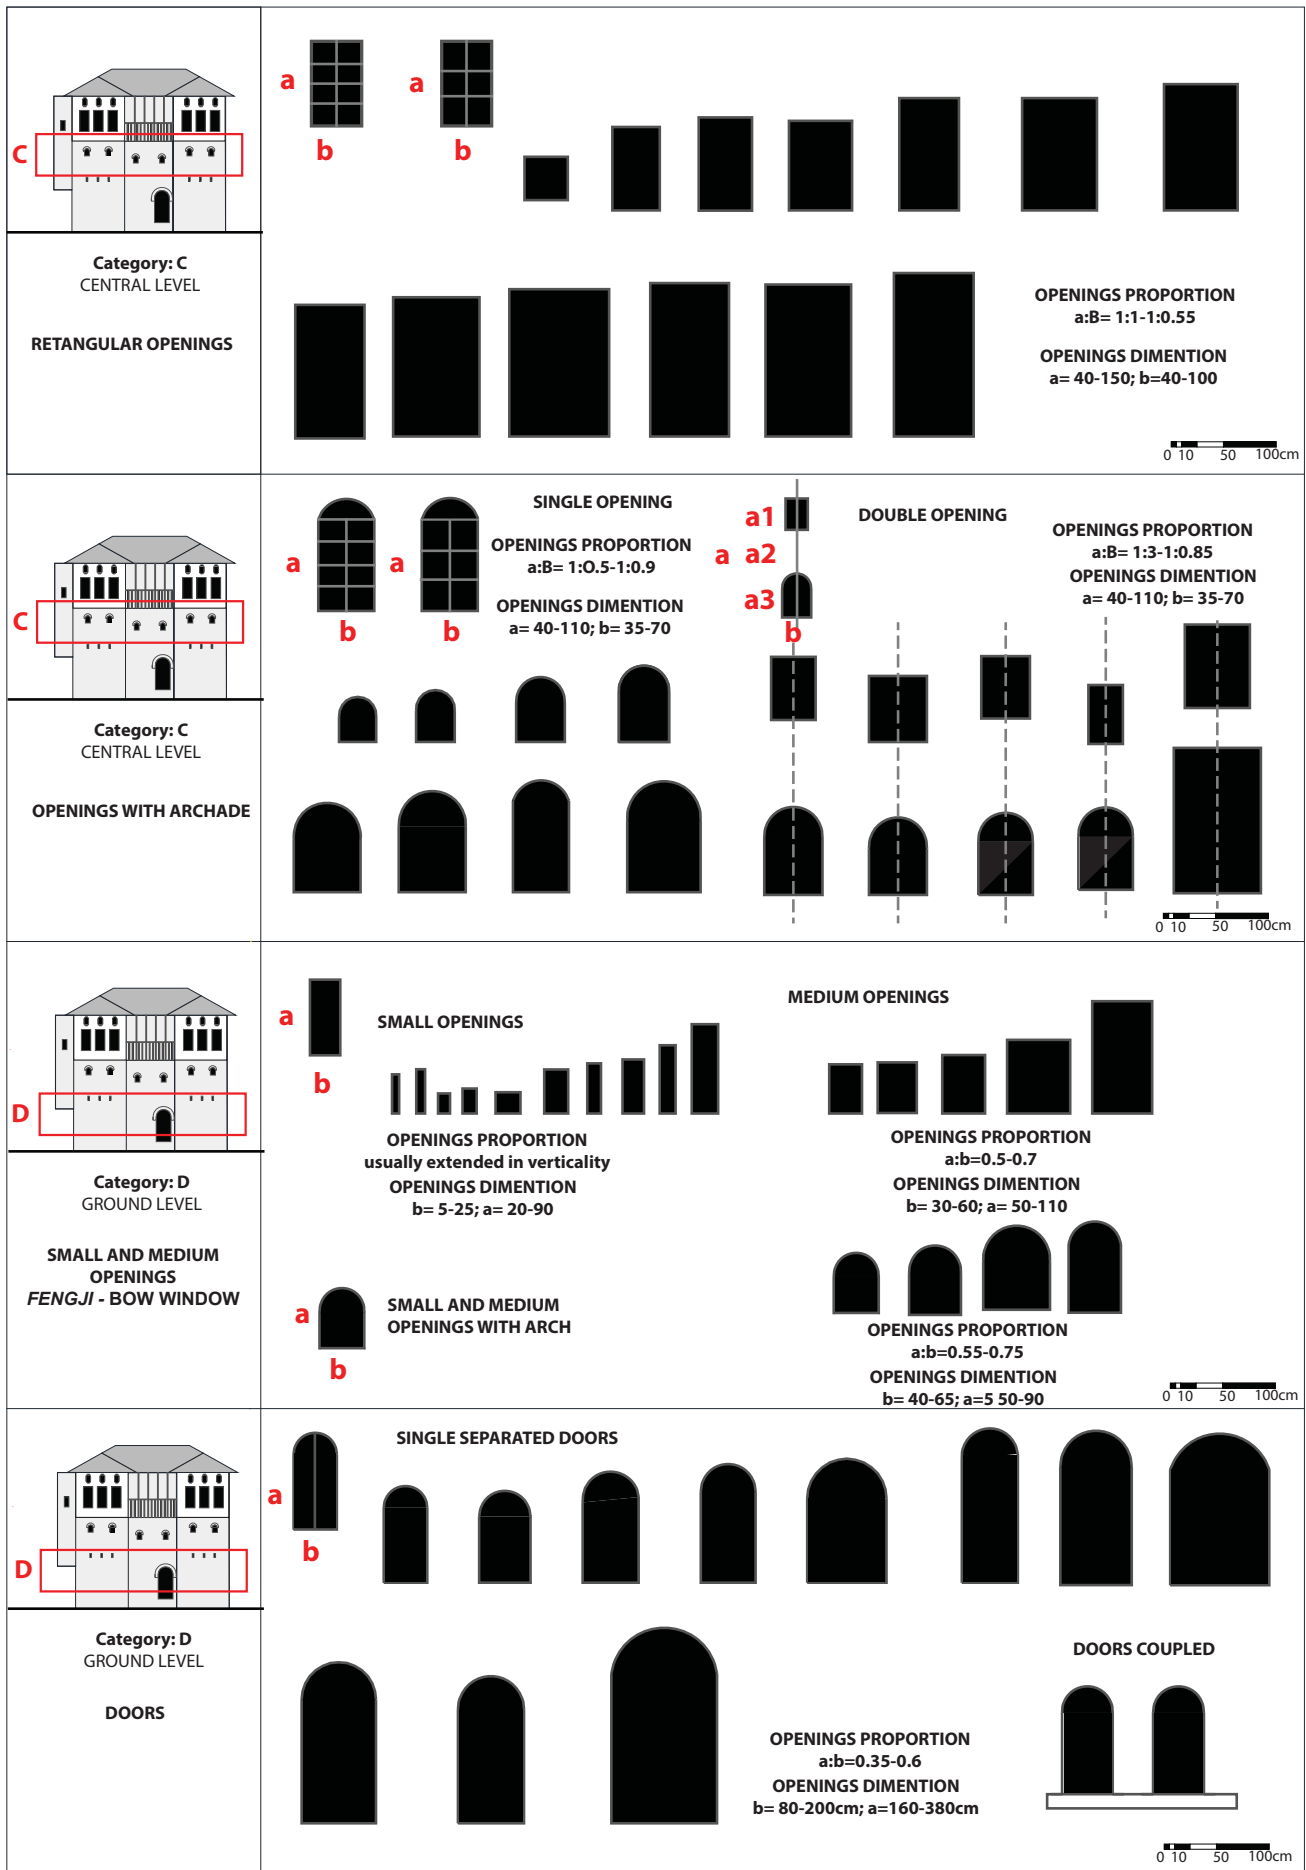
, Geometry and proportion constants of openings in the central-lower part of the facade of traditional house of Gjirokastra. (source: author's)
